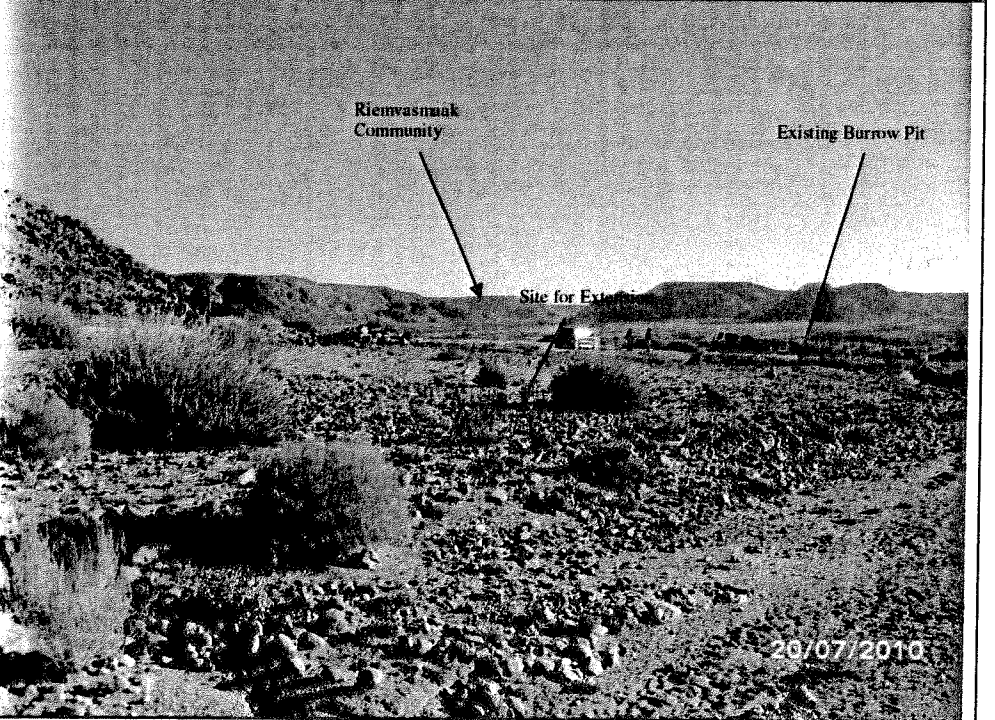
Showing existing Burrow Pit 1 in a north eastern direction.
